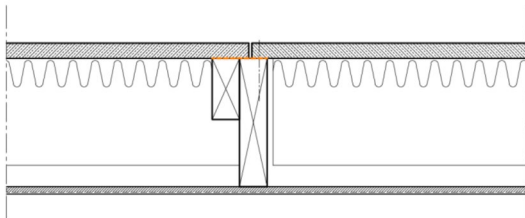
Section showing a wall-to-wall connection. Studs are screwed together.
